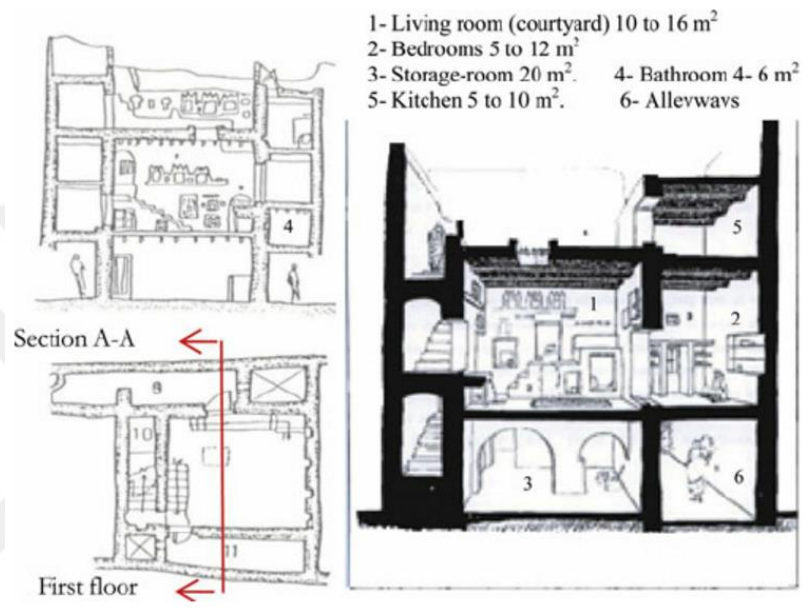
Floor plan and section of old houses in Ghadames (Alabid & Taki, 2014)
